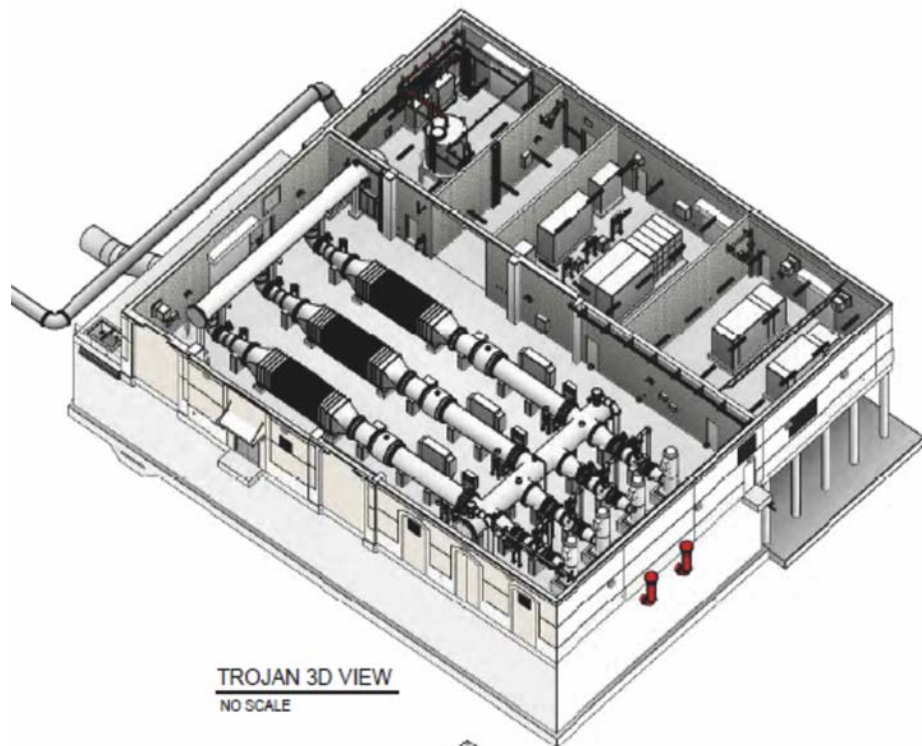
Flexible Building Design for Competing Ultraviolet Manufacturers (graphics: Stantec)
